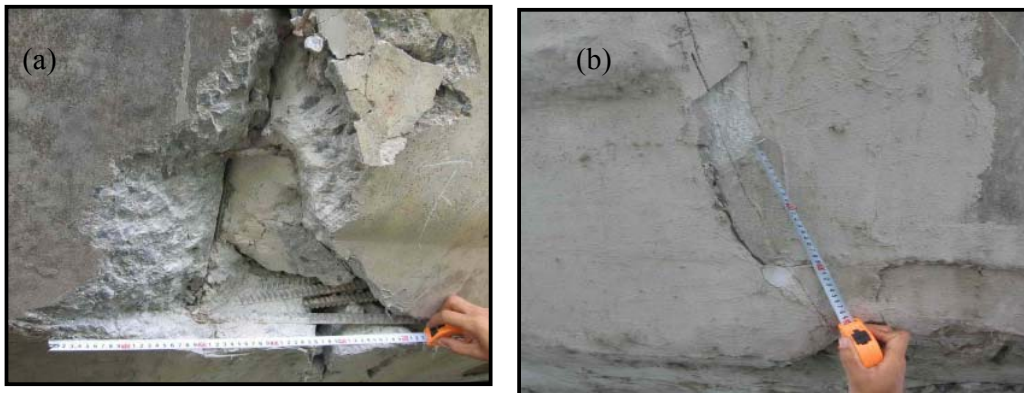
Cracks shape at (a) abutment and (b) mid span, respectively.
